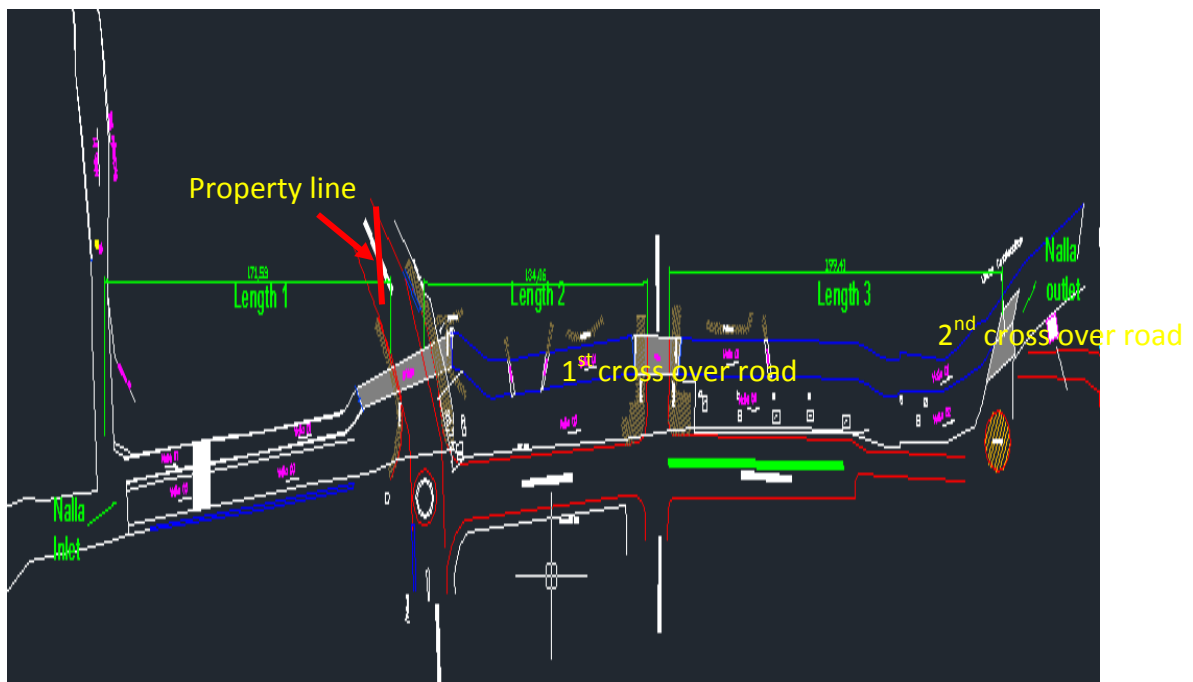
Existing nalla running through campus and divided into following length to easy to understand and work execution.
